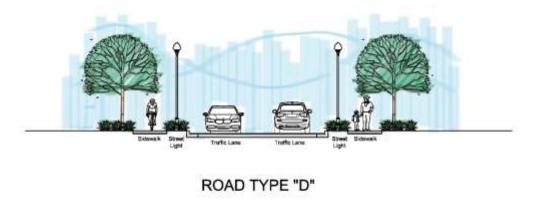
Epic Center PUD internal connector street with sidewalks and tree plantings.
